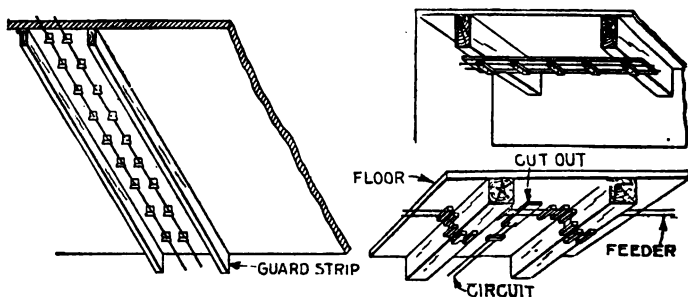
,949.—Method of protecting exposed wiring on low ceilings by two guard strips.
